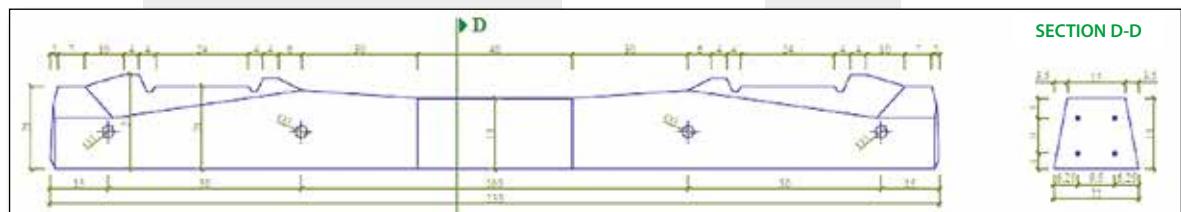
Prestressed concrete sleeper TIP BH70-230
